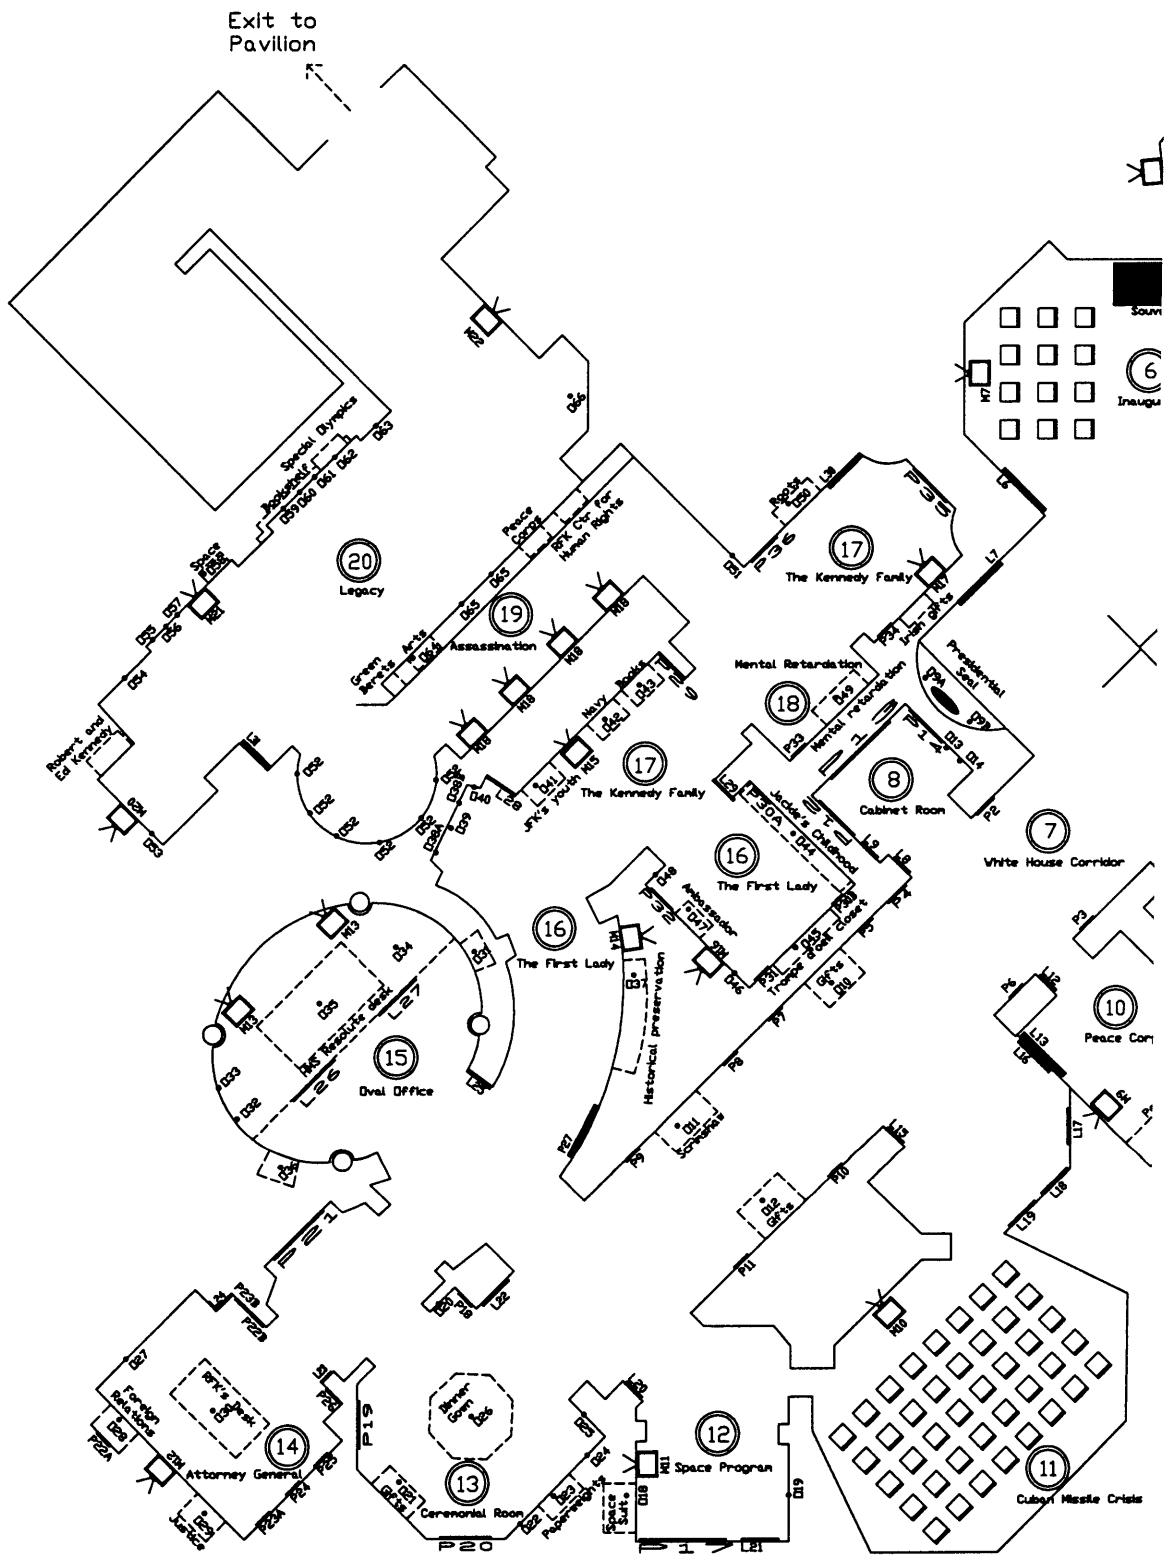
Second section of the floor plan of the Kennedy Museum.
